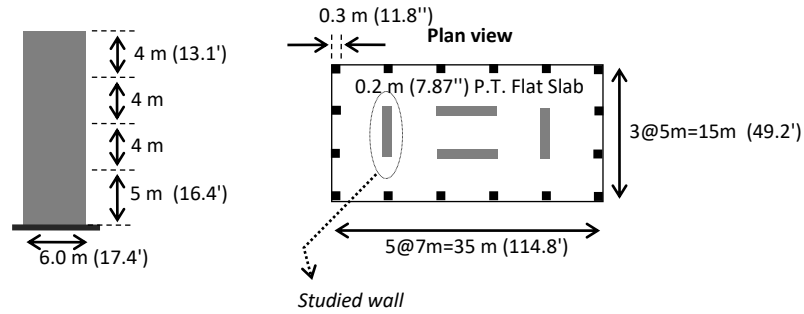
Unbonded post-tensioned reinforced concrete wall.
